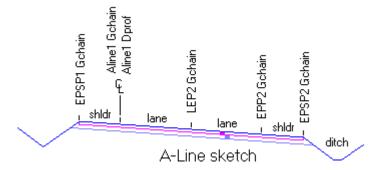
Sketching out the roadway section is a great way to keep focused.
